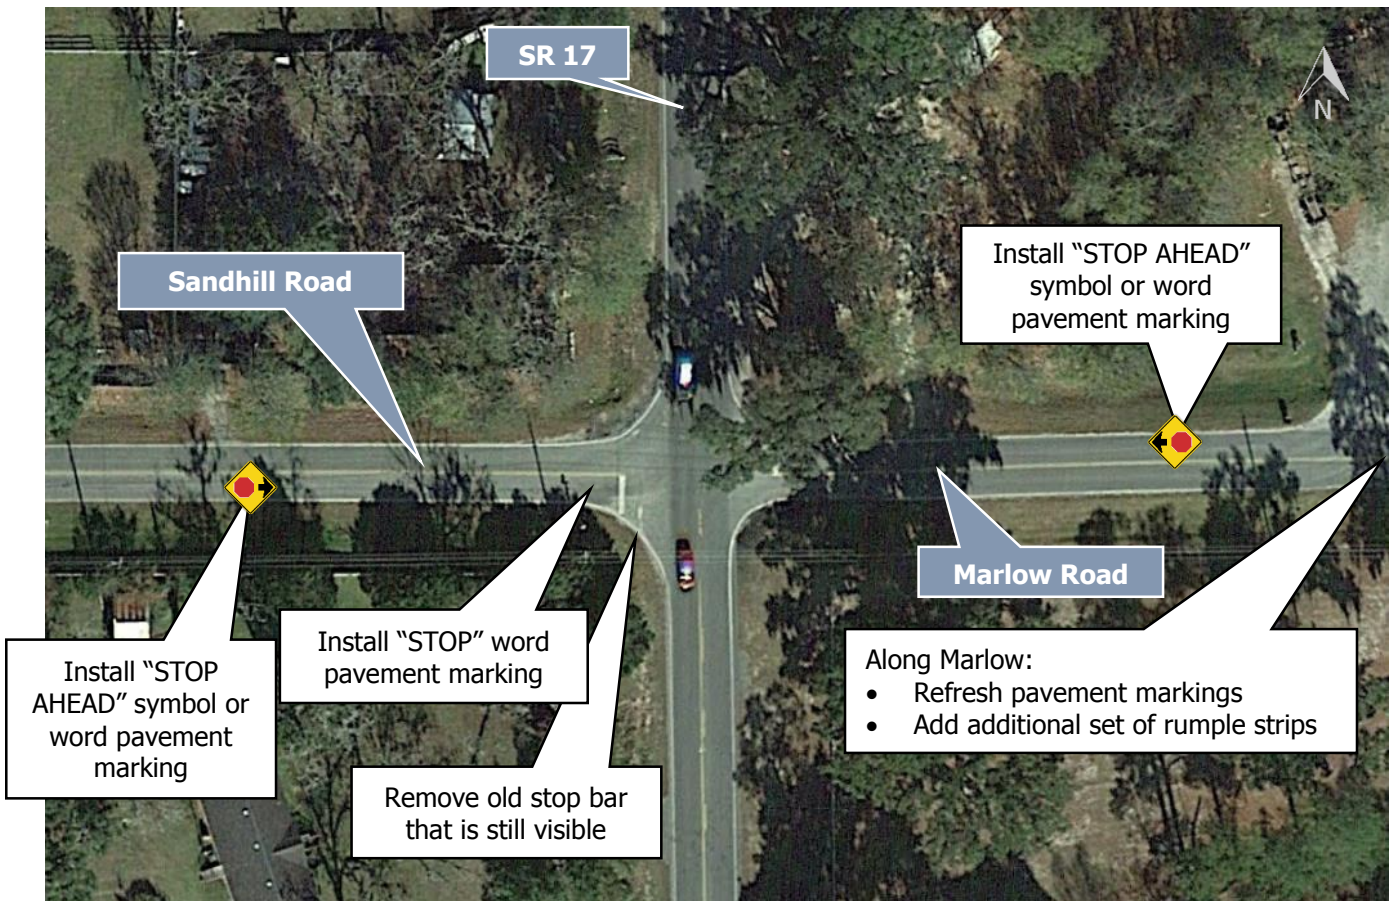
RECOMMENDED SHORT TERM PAVEMENT MARKING IMPROVEMENTS
